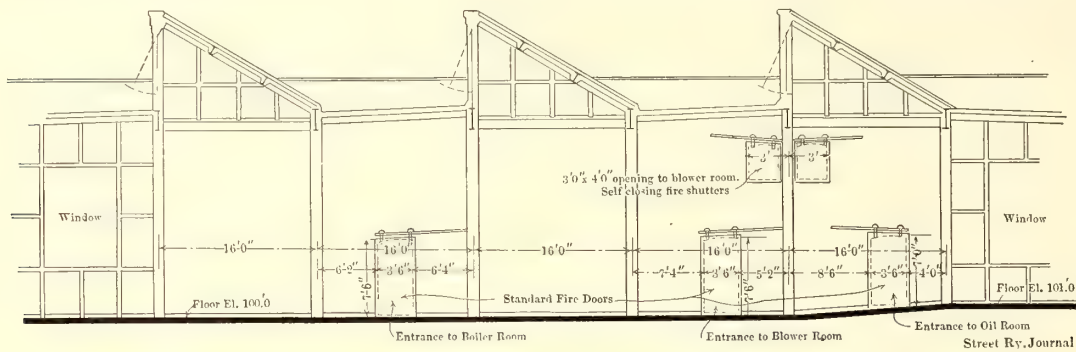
ELEVATION SHOWING FIRE DOORS AND SHUTTERS, LOOKING AT BOILER HOUSE FROM INSIDE OF INSPECTION SHED
